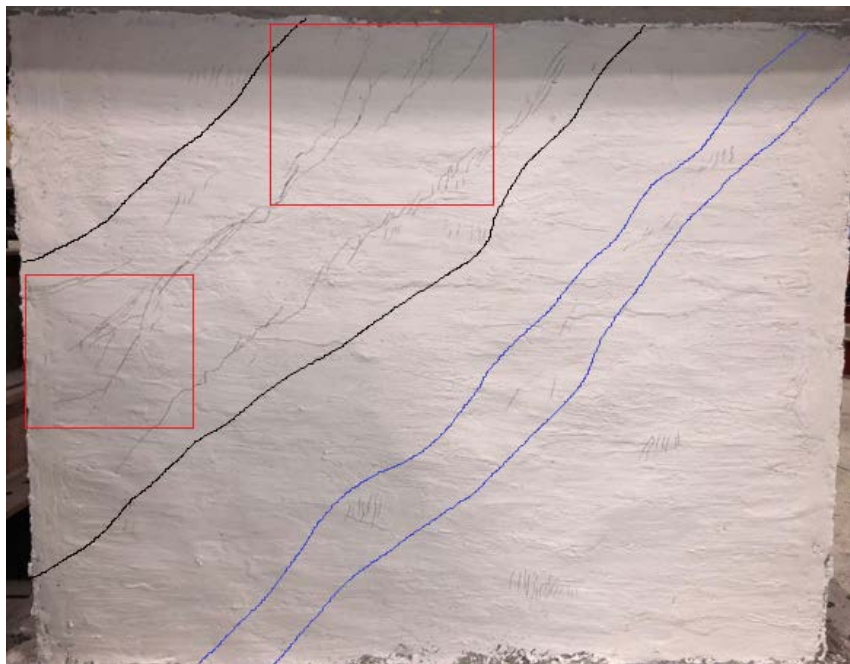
SW-75-150-02 crack pattern in the masonry.
